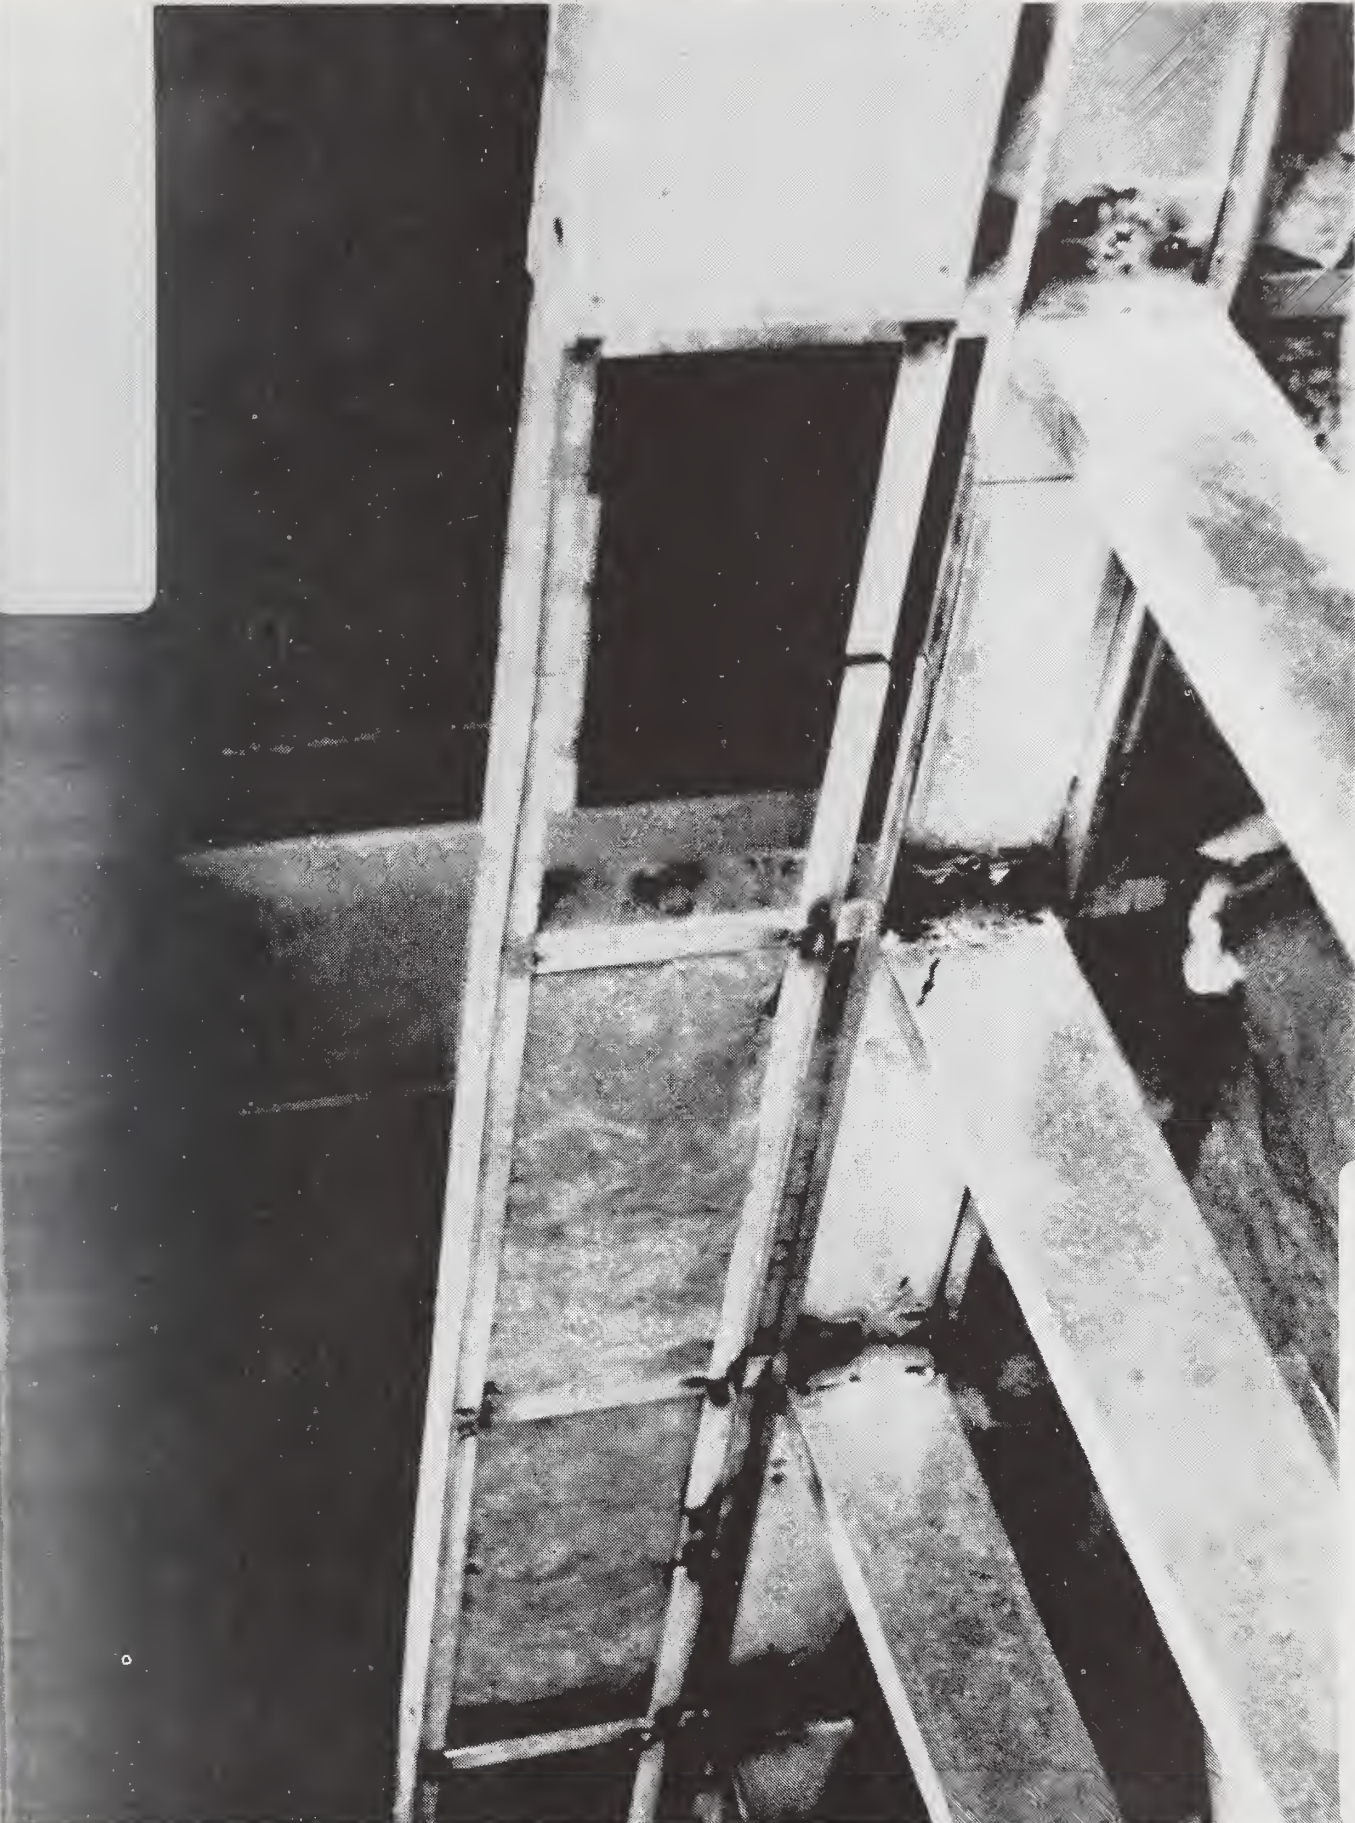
Floor Framing Showing Construction of Stud Walls, and Ceiling Insulation
